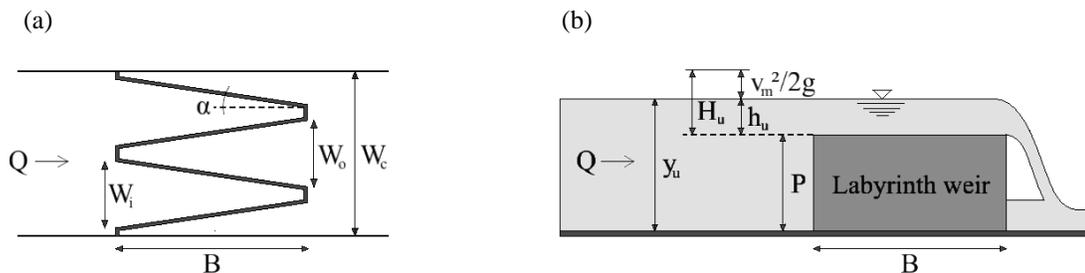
Plan view (a) and section (b) of a trapezoidal labyrinth weir with geometrical (based on Falvey (2003)) and hydraulic parameters.
